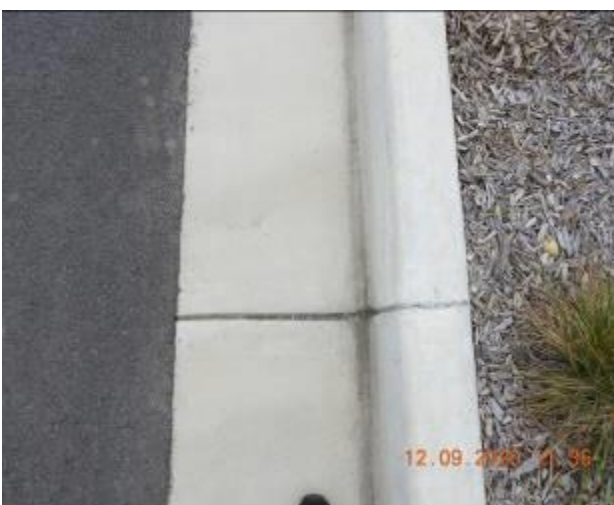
Crack propagation and loss of material through kerb and gutter
